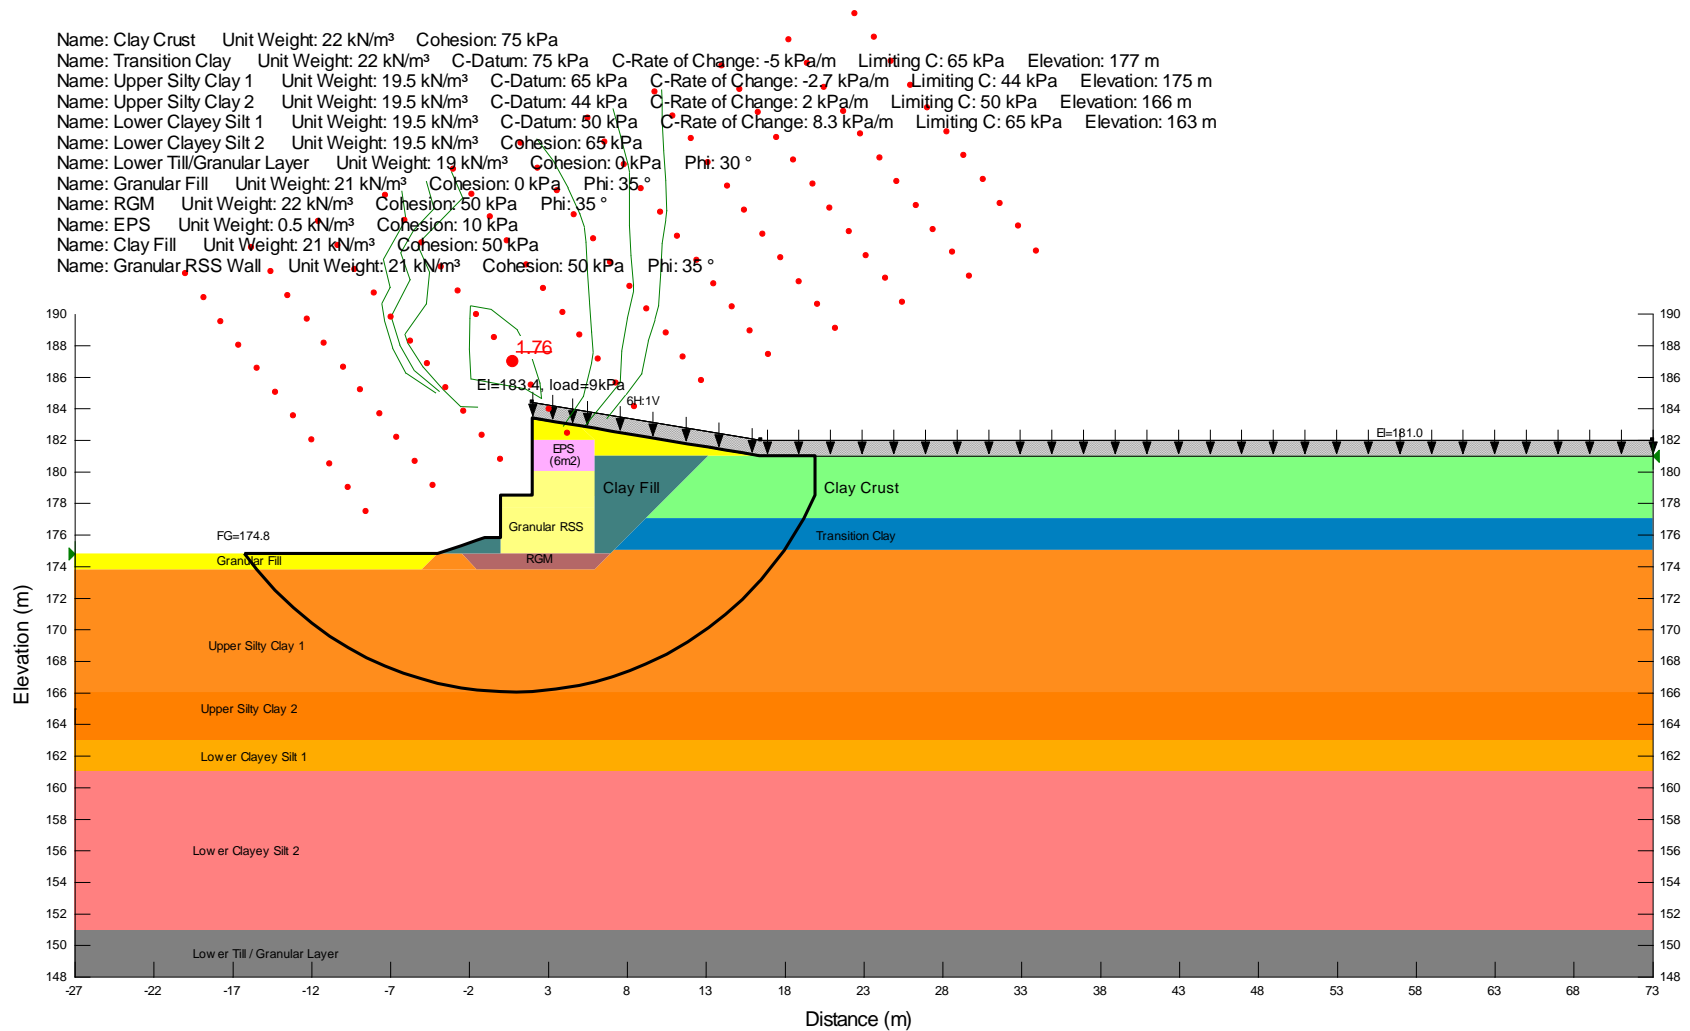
Slope Stability – End of Construction - South Abutment - Station 10+450L Hwy 401
